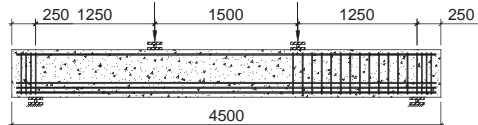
Reinforcement scheme and test set-up for concrete test specimens.
